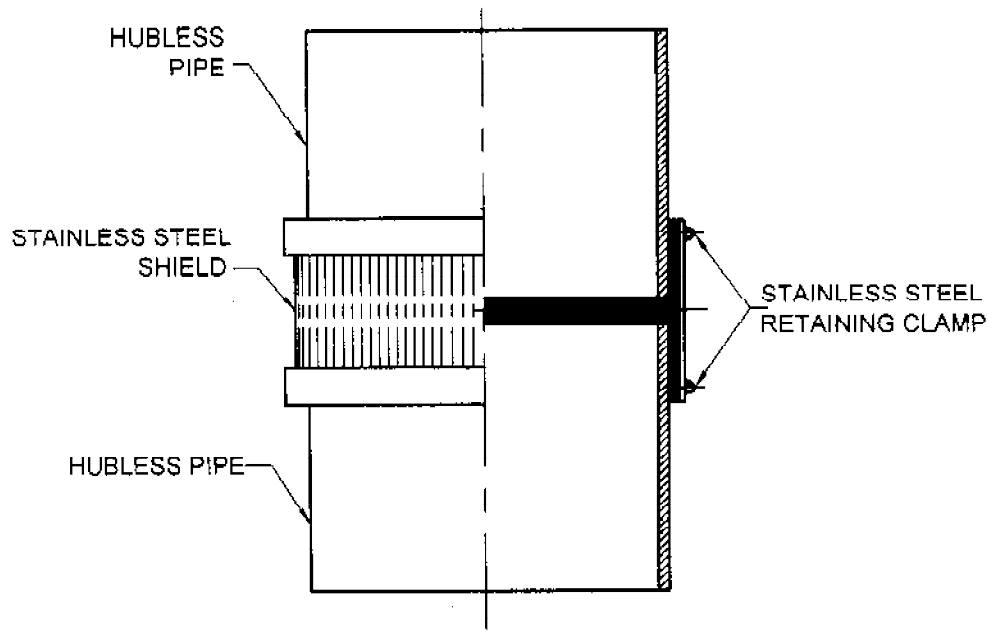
TYPICAL HUBLESS COUPLING JOINT-INSTALLATION
